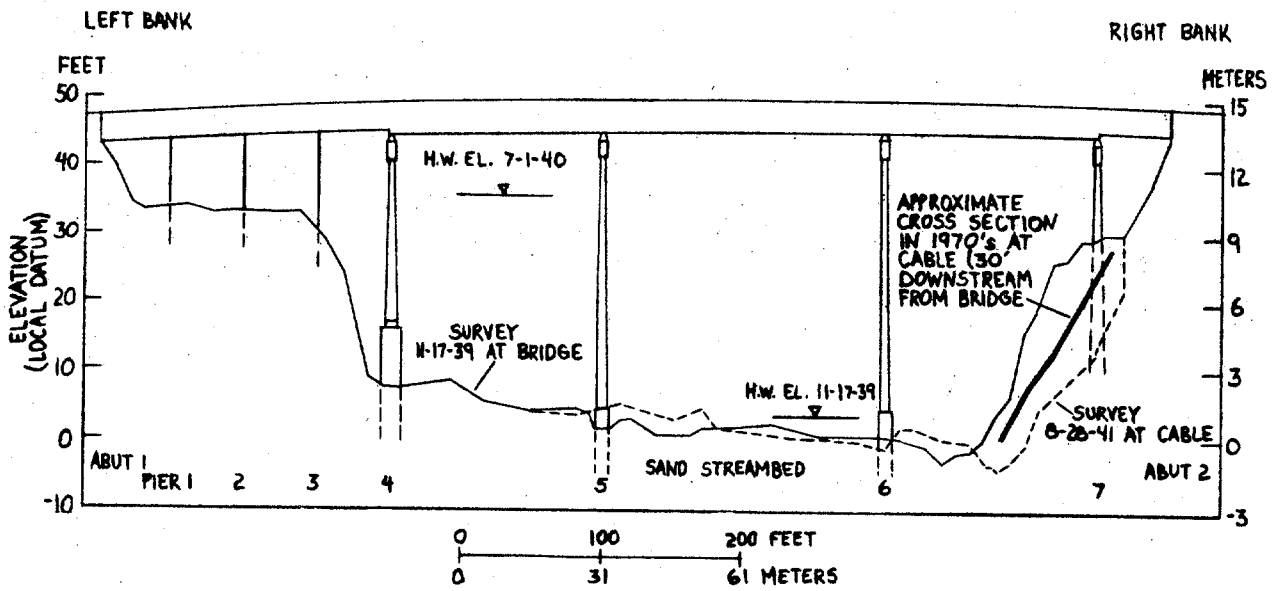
Changes in channel cross section at US-90 bridge between 1939 and the mid-1970's, Colorado River.
